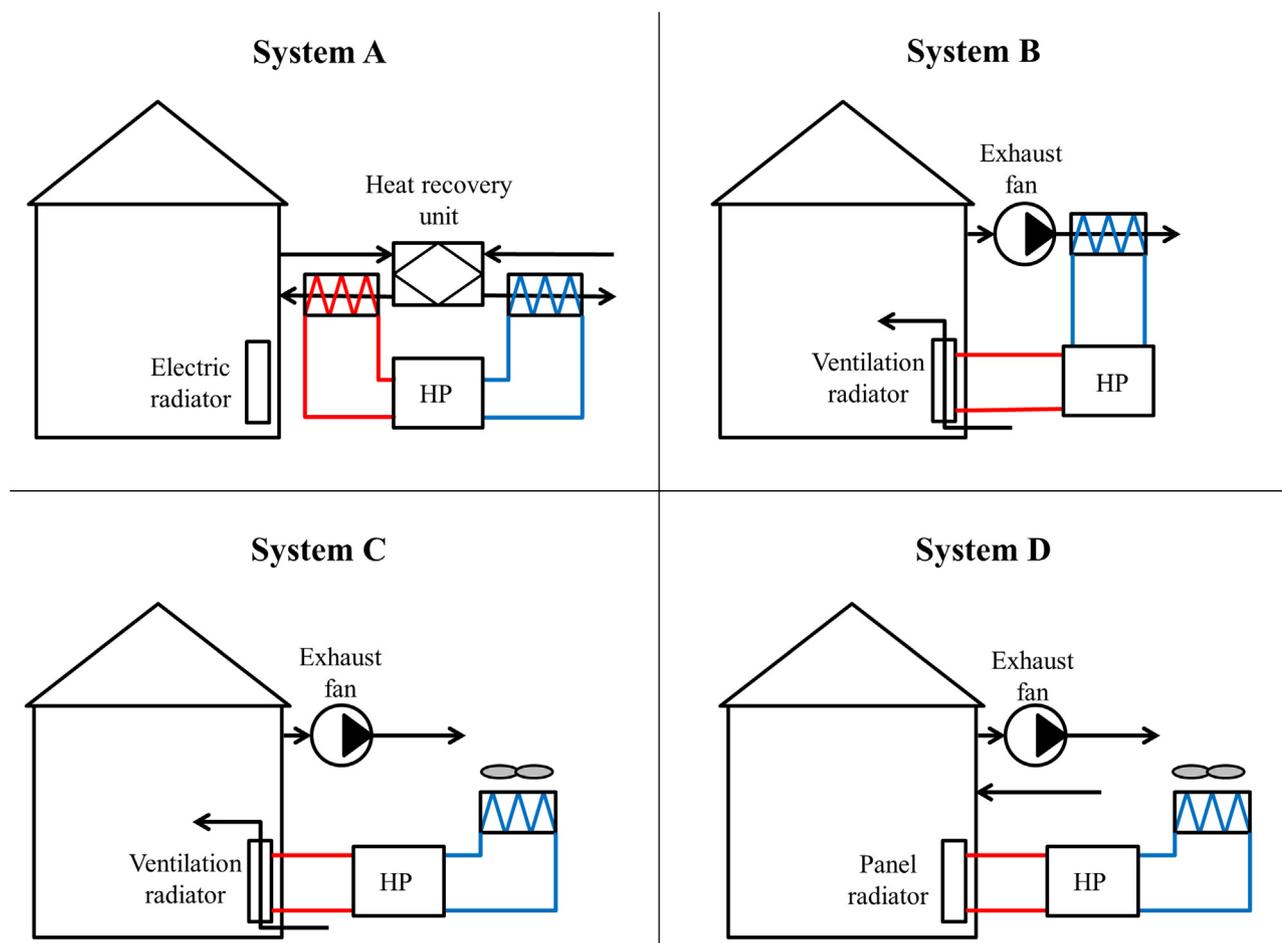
Schematic layout of studied HVAC systems: (A) mechanical ventilation with heat recovery (MVHR), micro heat pump and electric radiators, (B) exhaust ventilation with exhaust air-to-water heat pump and ventilation radiators, (C) exhaust ventilation with air-to-water heat pump and ventilation radiators and (D) exhaust ventilation with air-to-water heat pump and panel radiators.
